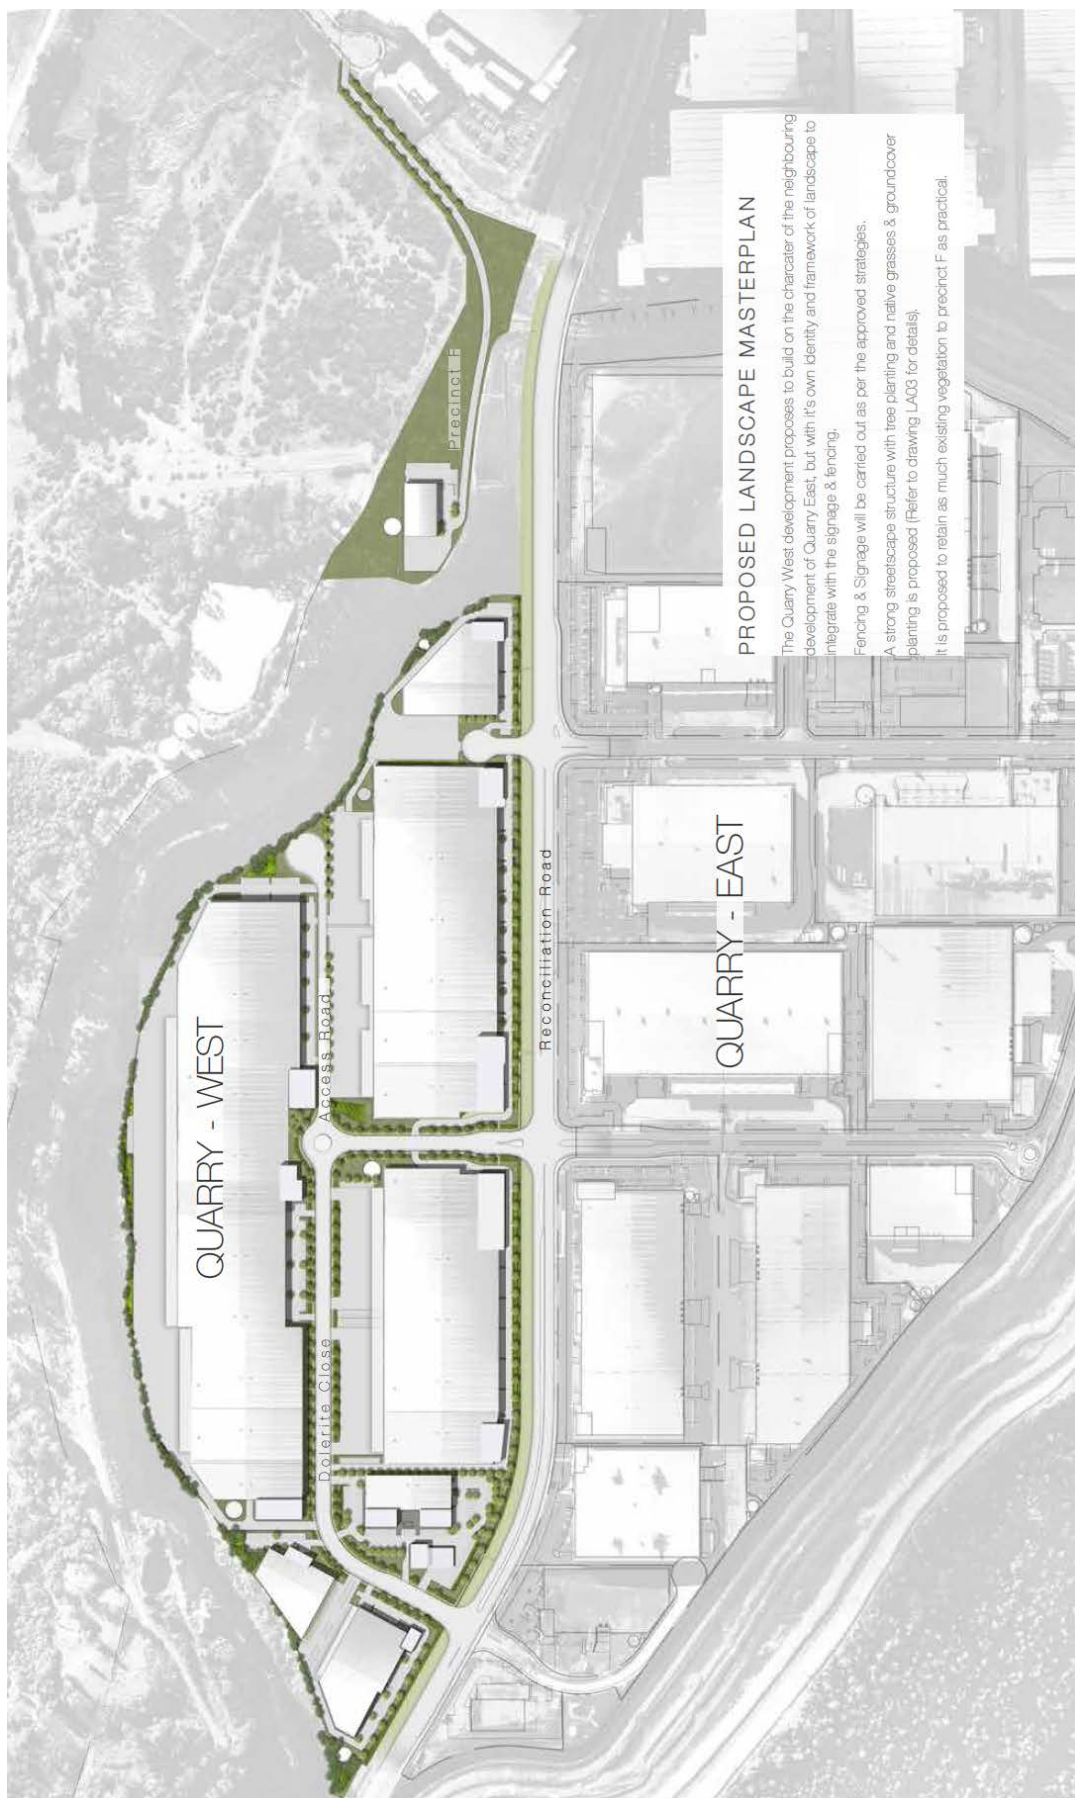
Proposed Landscape Masterplan (Source: Site Image)
